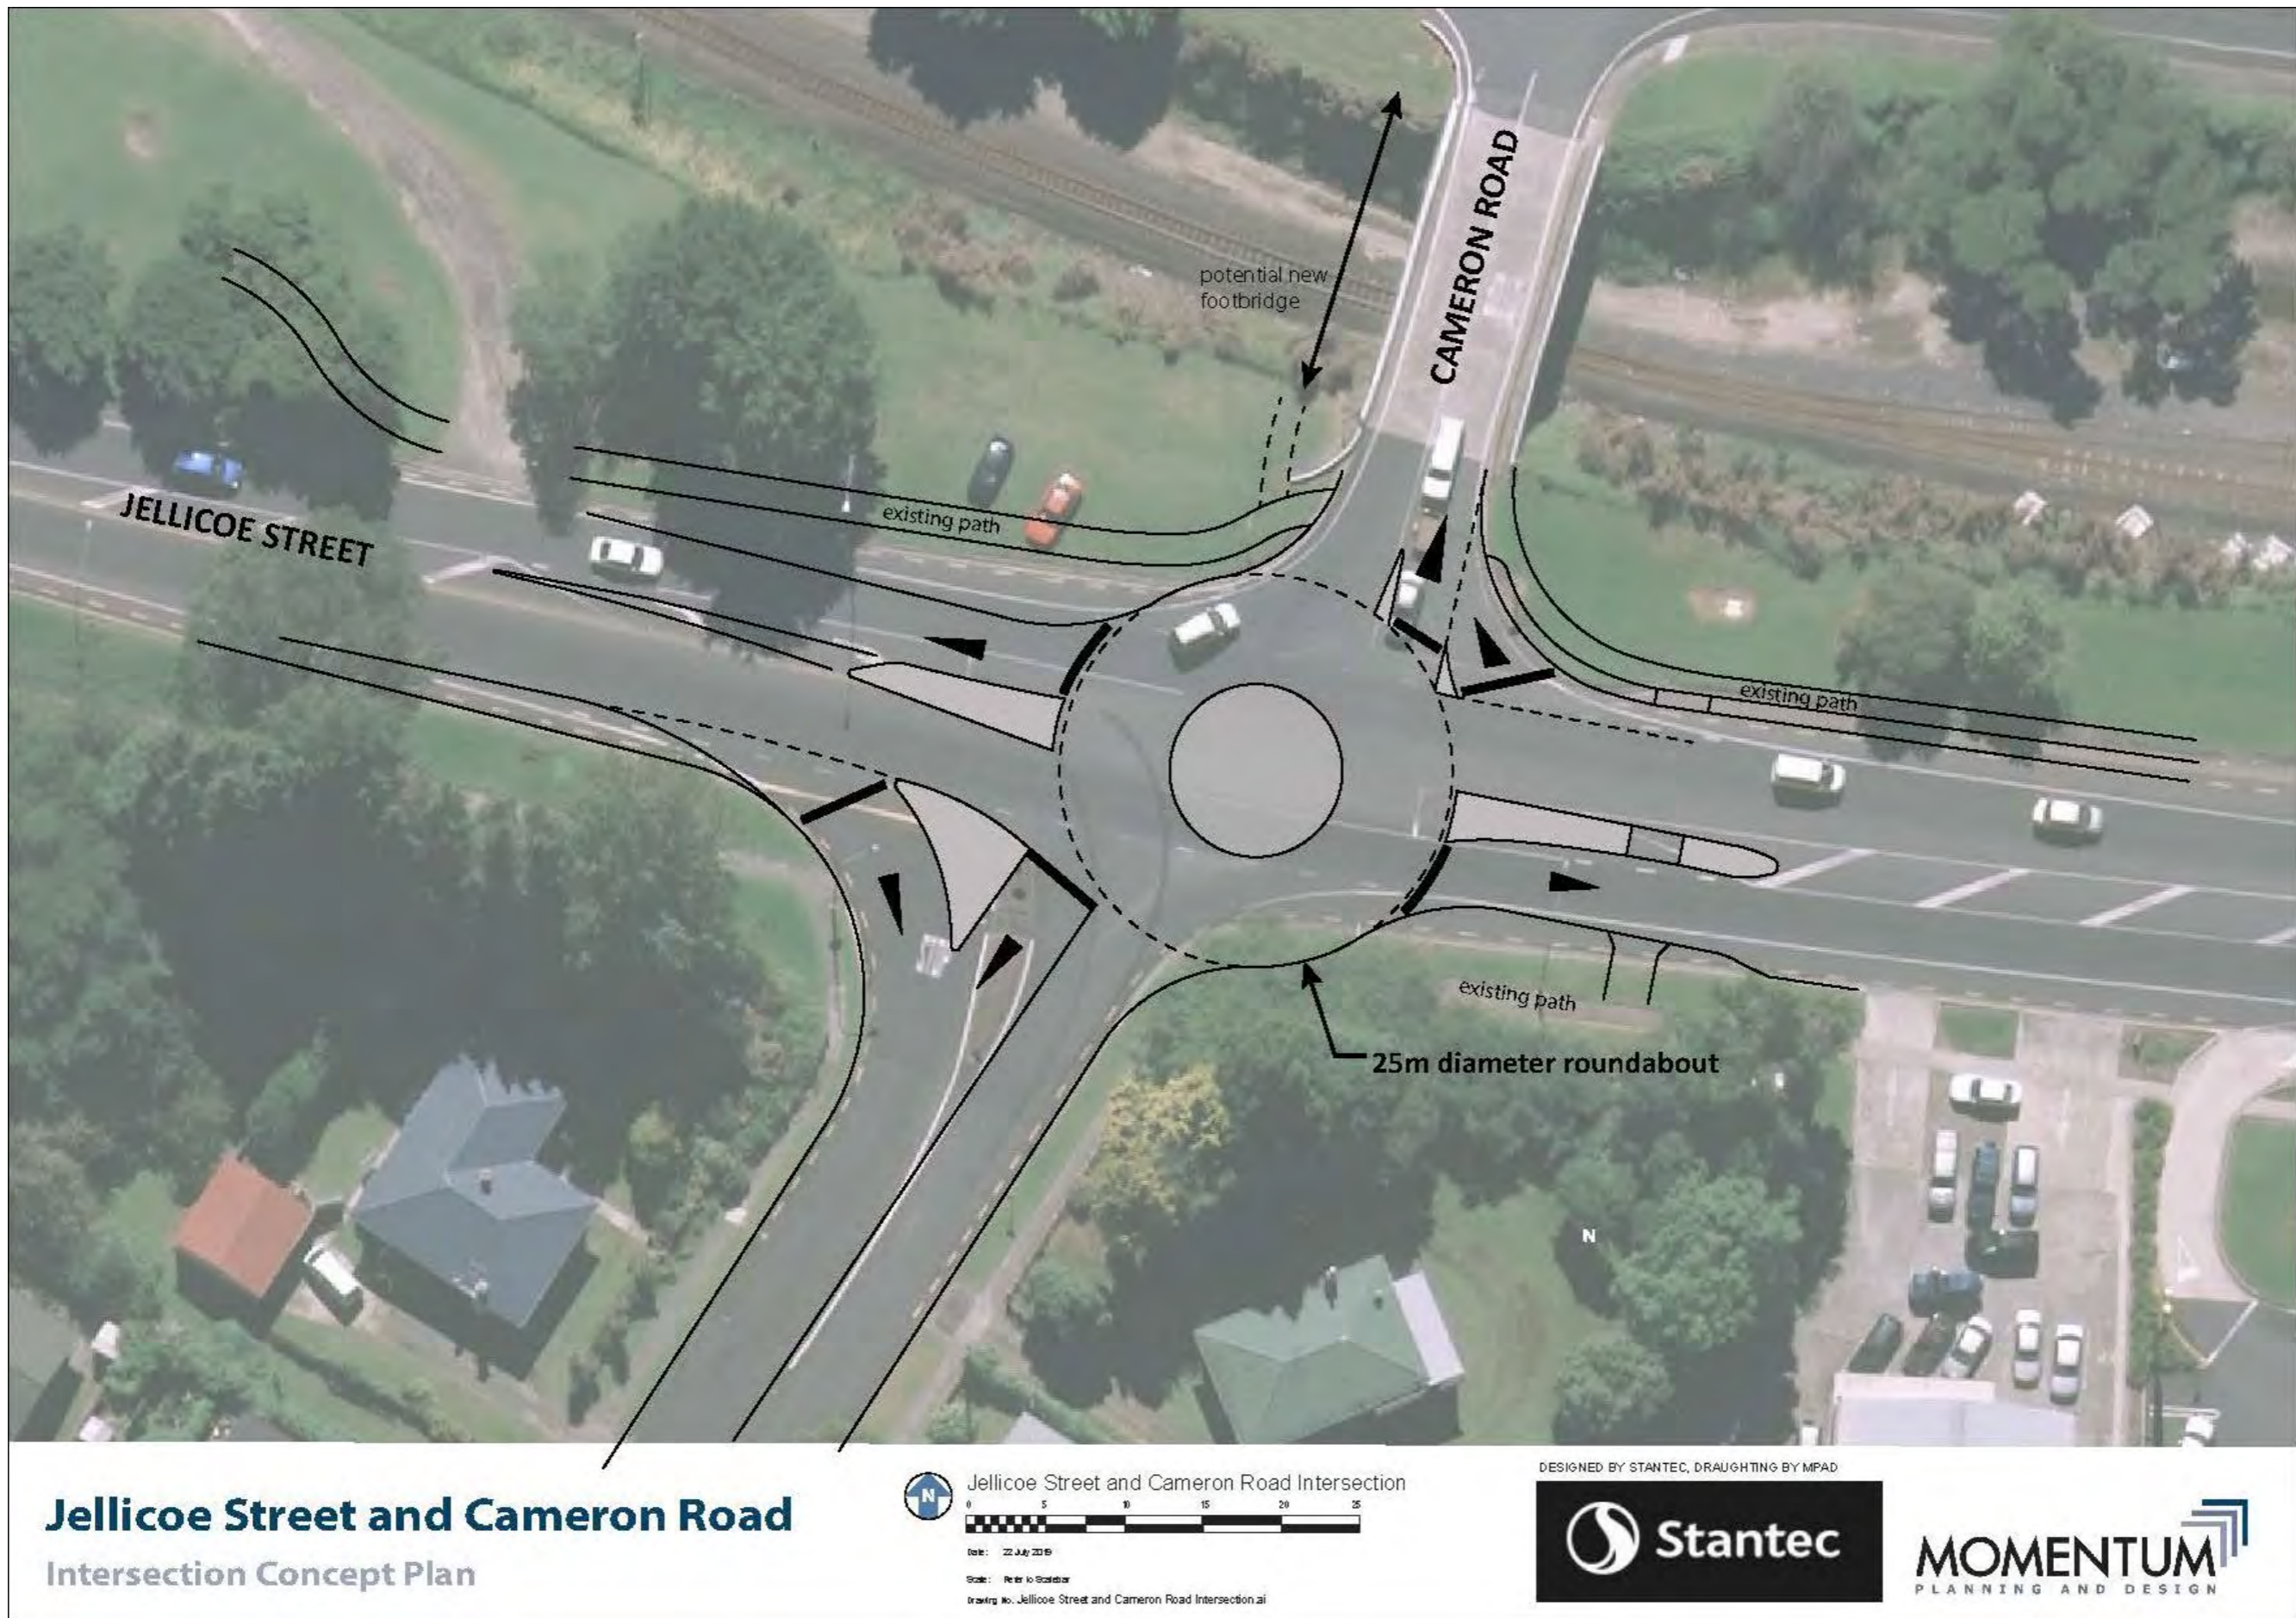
Concept design for a roundabout at the intersection of Jellicoe Street and Cameron Road
